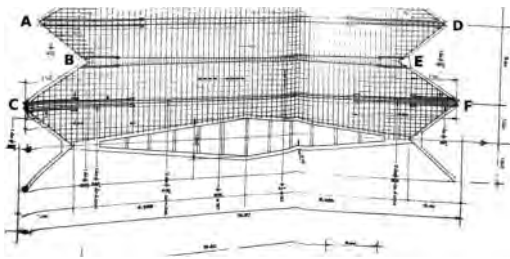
Plan of two sections of the San Antonio de Padua church roof. The central and one adjacent section are shown. The unmade skylight can be seen in the central section (Alberto González Pozo Archive in the A.A.M.).
